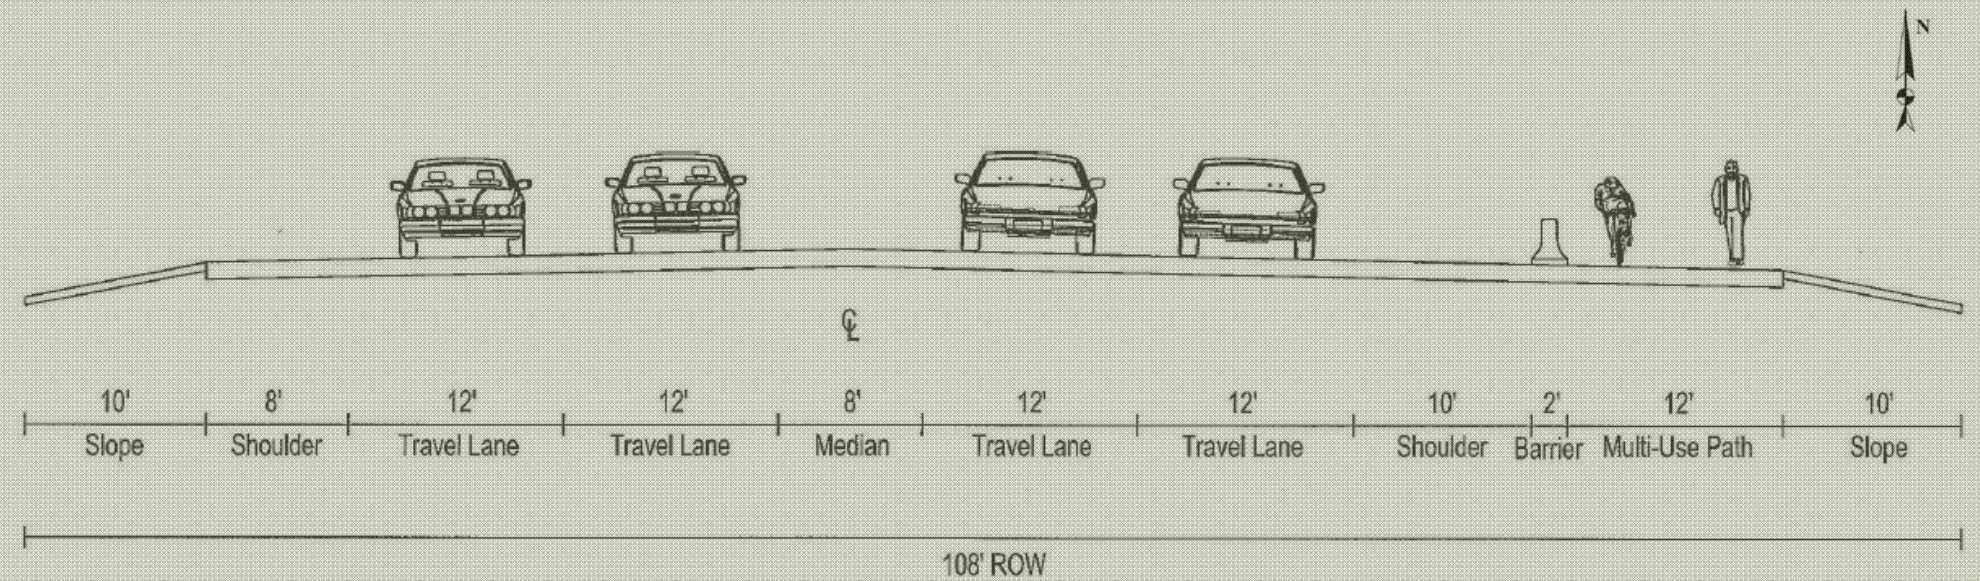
Recommended Corridor Plan: Coyote Creek to west of Fisher Road
